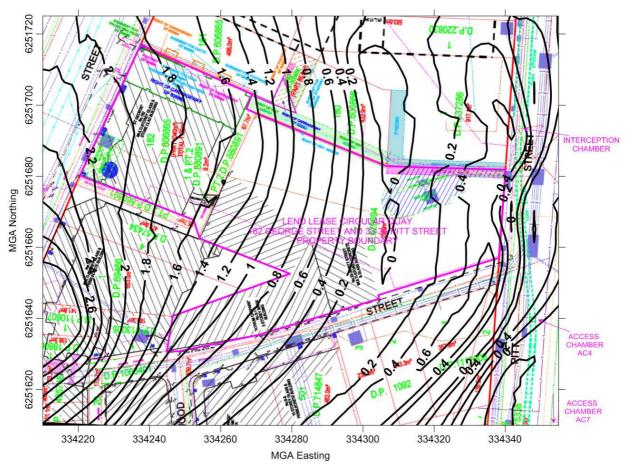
Inferred Elevation of Base of Fill (contours show elevation in metres AHD)
